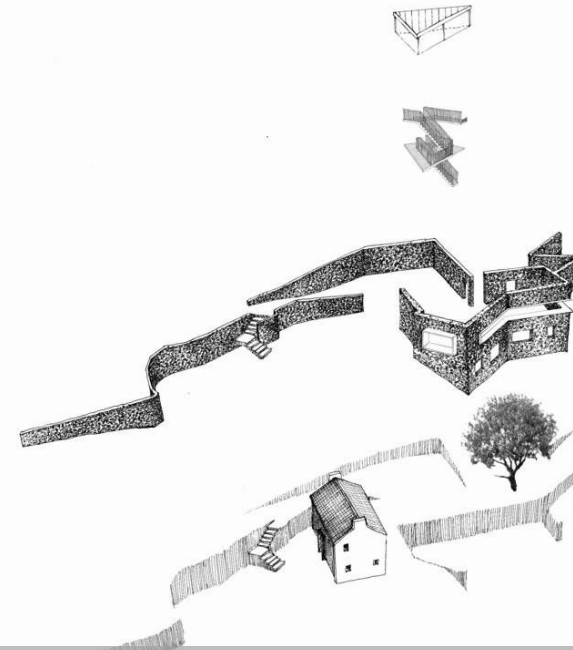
Exploded view of stone wall (ArchDaily, 2019).
